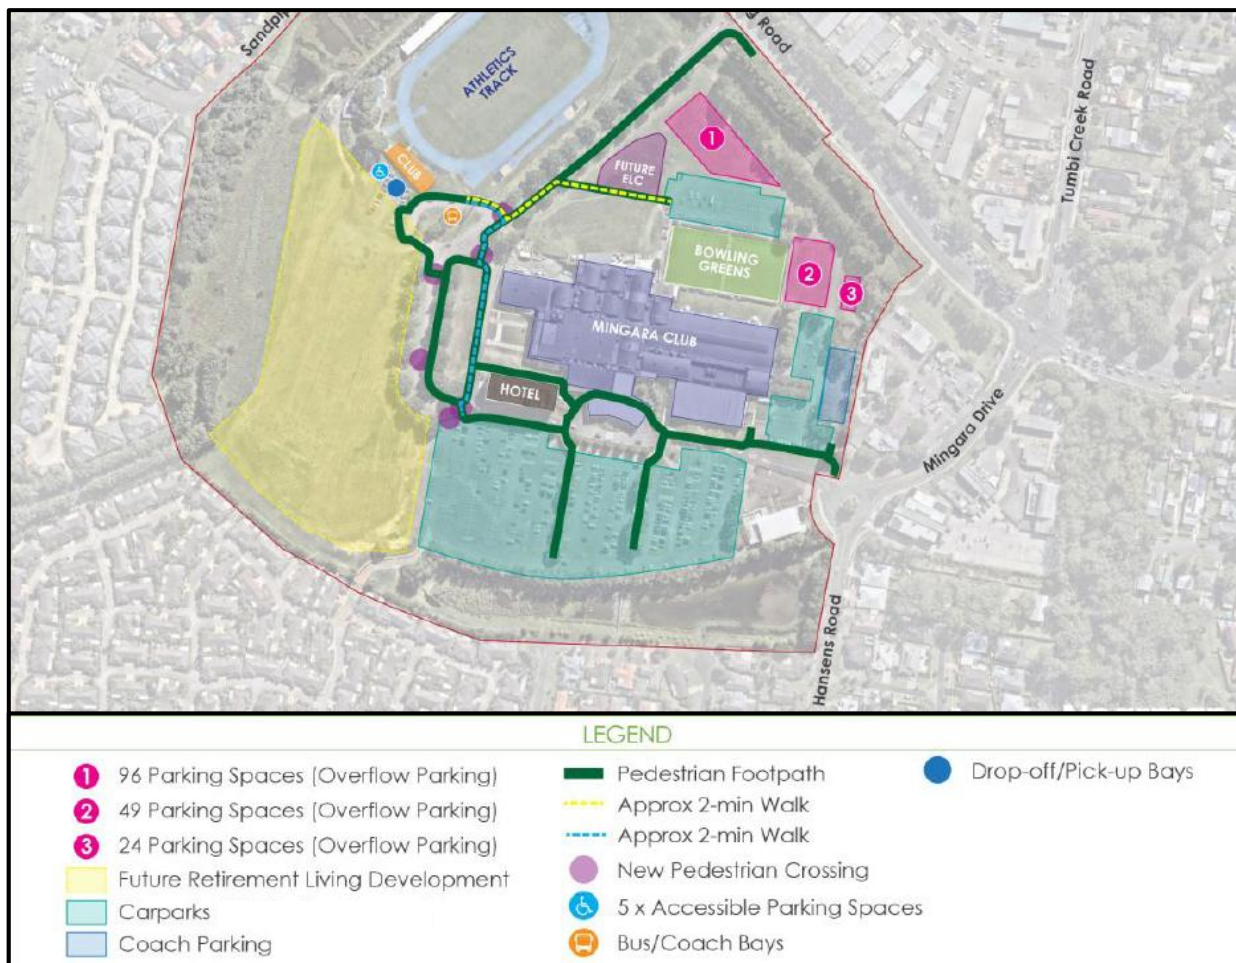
| Overflow car parking locations shown in pink (source: Amendment Report)
